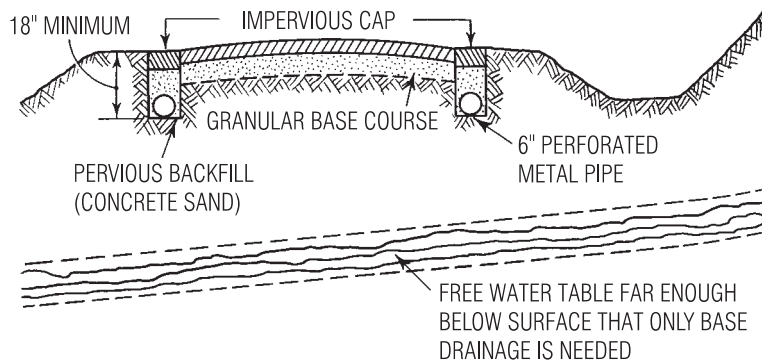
Drains remove surface water that may be trapped when a pervious base is laid over a relatively impervious subgrade. On steep slopes, lateral may be added under the pavement. Longitudinal base drains should be outletted at convenient points, which may be 100 ft or more apart. (*Handbook of Drainage and Construction Products*, Metal Products Division, Armco Steel Corp.)
